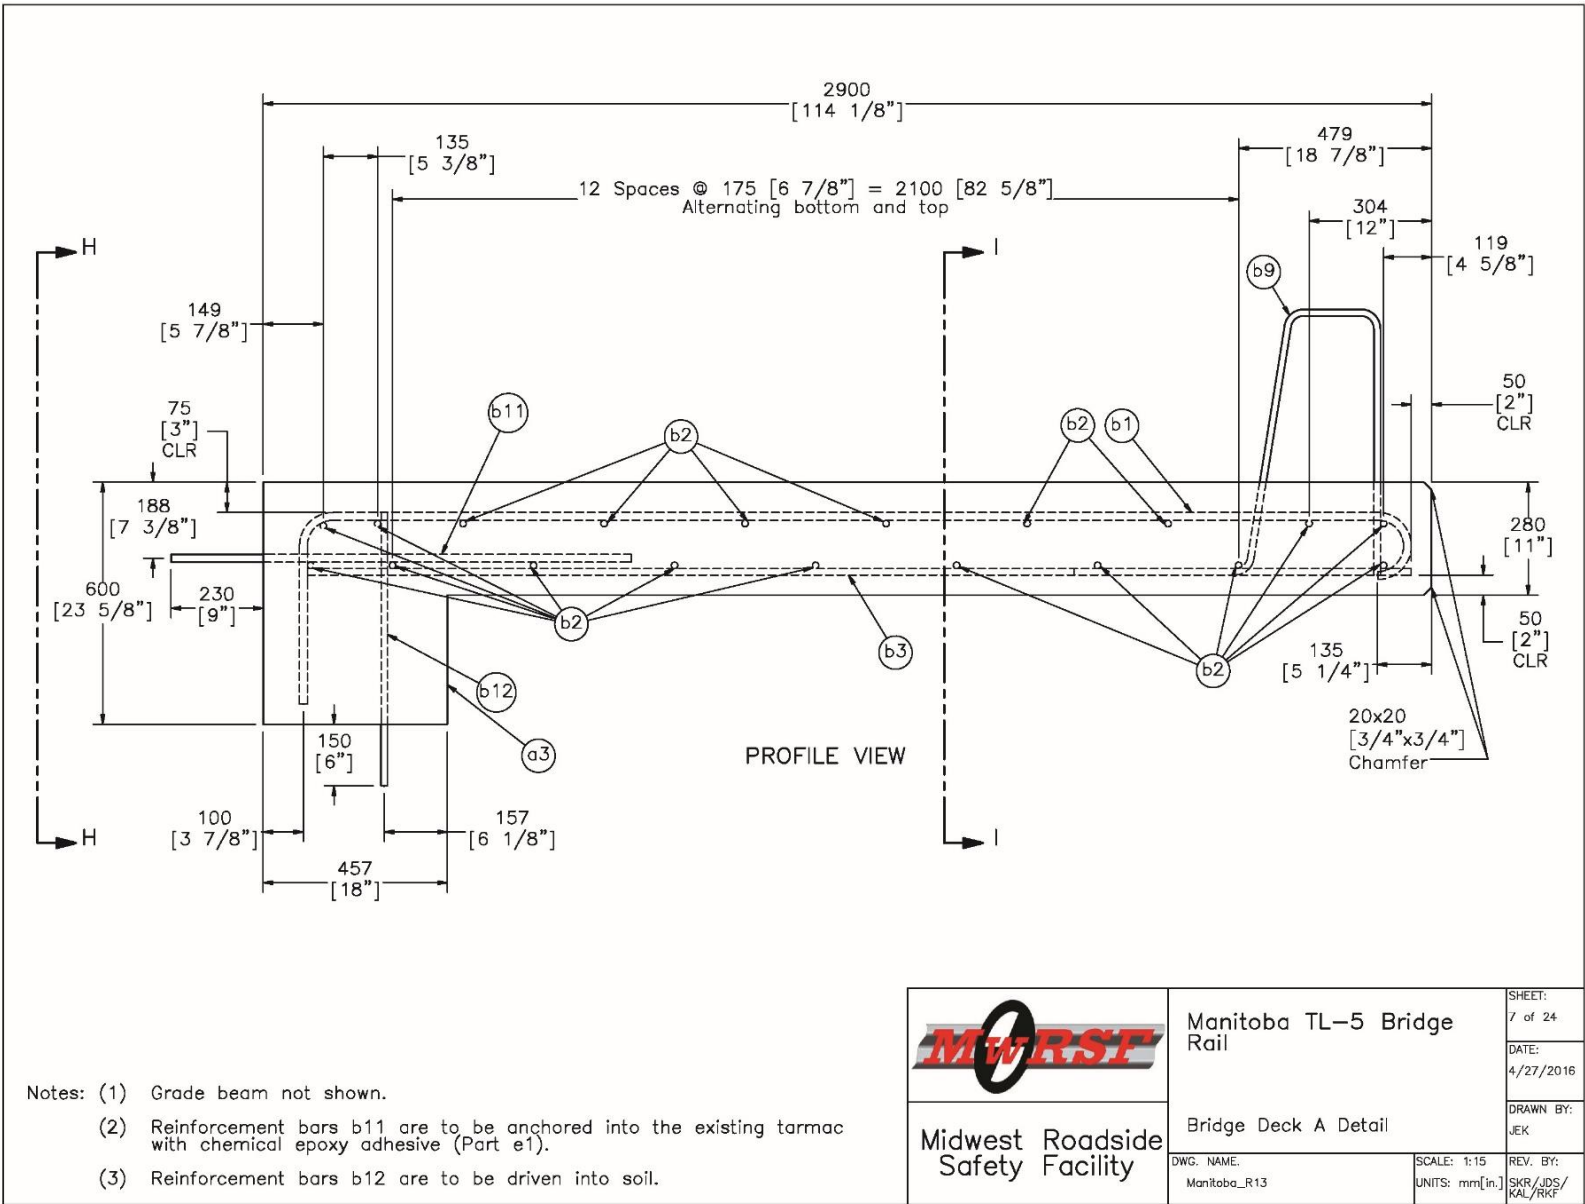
Bridge Deck A Detail, Test No. MAN-1
